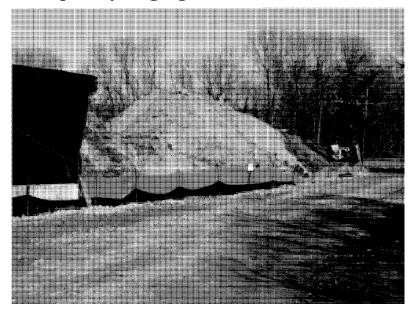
D2 Area – Ramp Constructed in Potentially Impacted Material to Assist in Backfilling Activities (4/16/2010) Notice stockpiles of Potentially Impacted Material to West of Excavation
